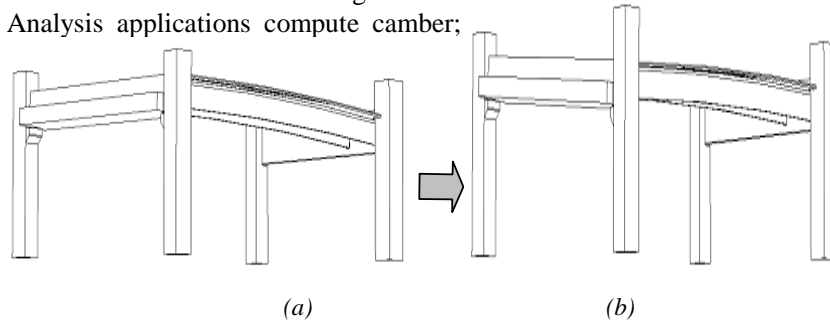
Cambering and warping of precast structural tees in a floor spanning assembly.
